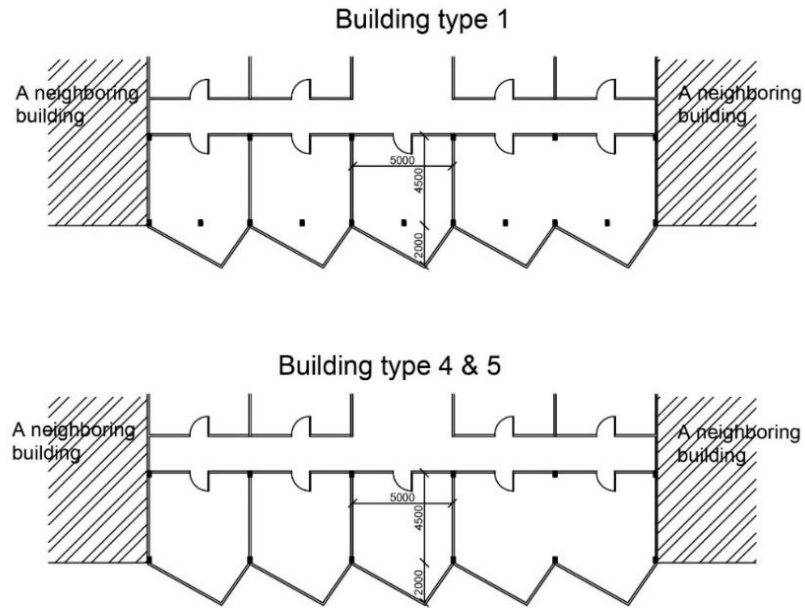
A conceptual diagram that shows multi-angled façade systems added to the front façade of buildings of types 1, 4, and 5
